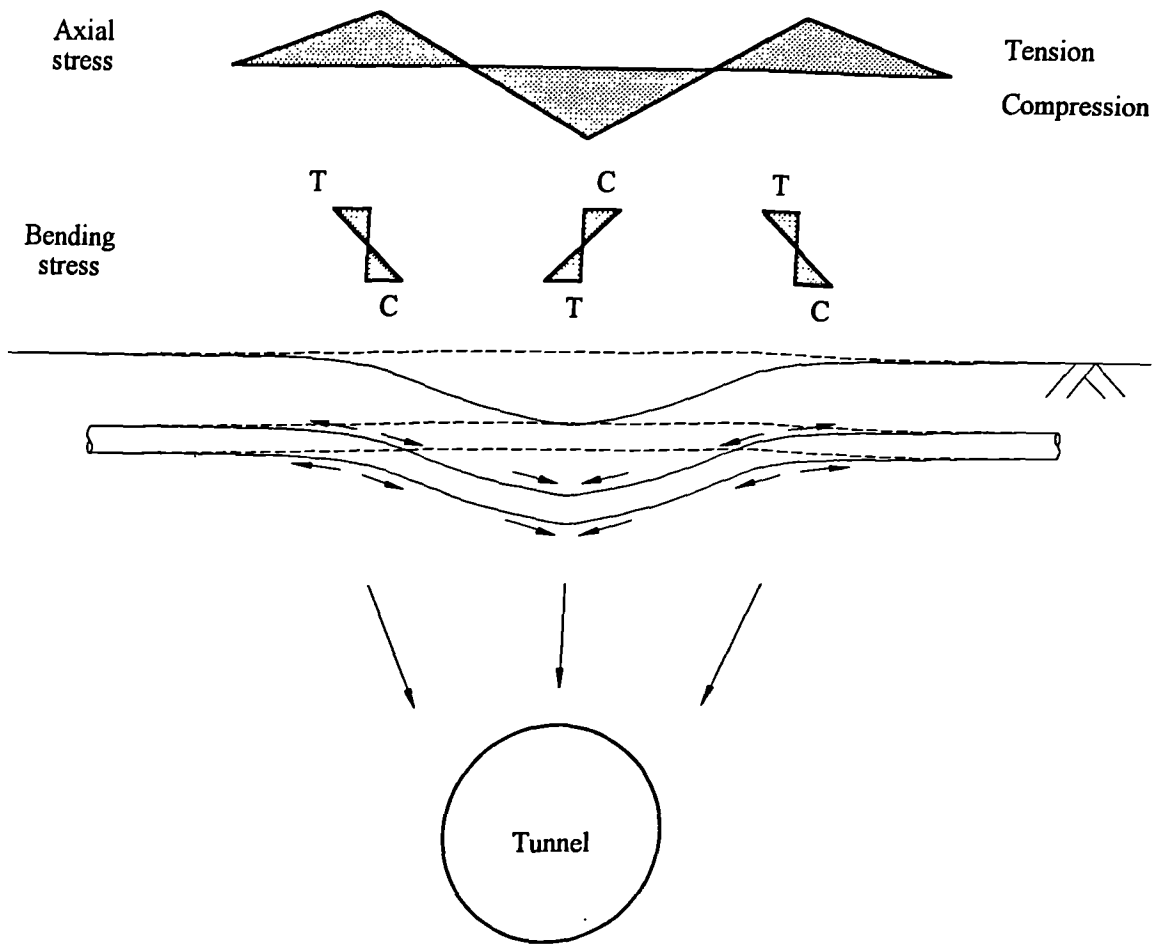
Ground and pipe deformation due to soft ground tunnelling.
